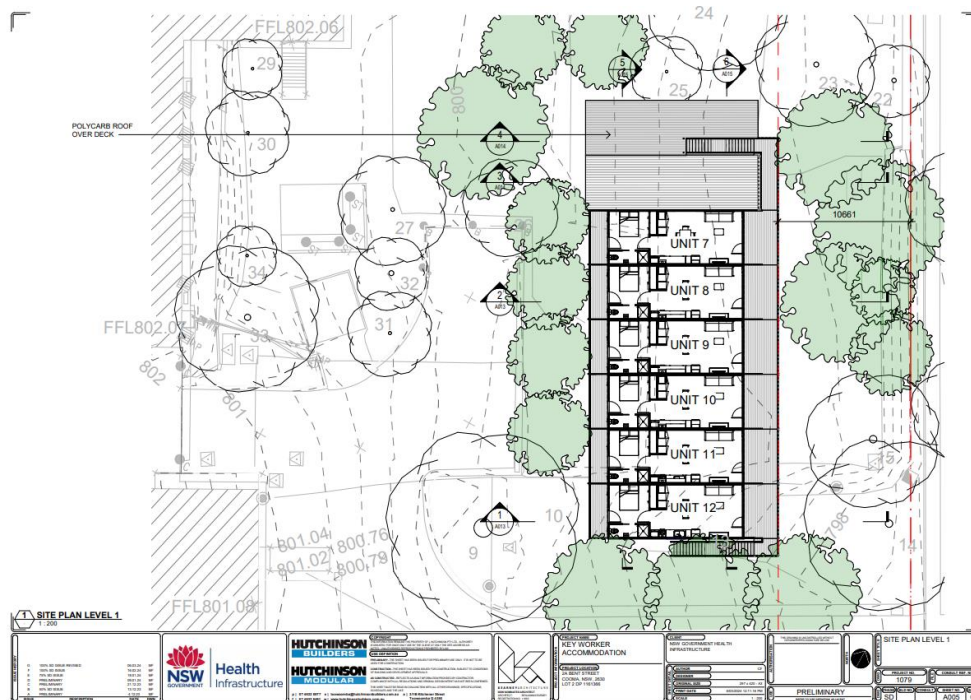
Site plan level 1 (Source: Kearney Architecture)
